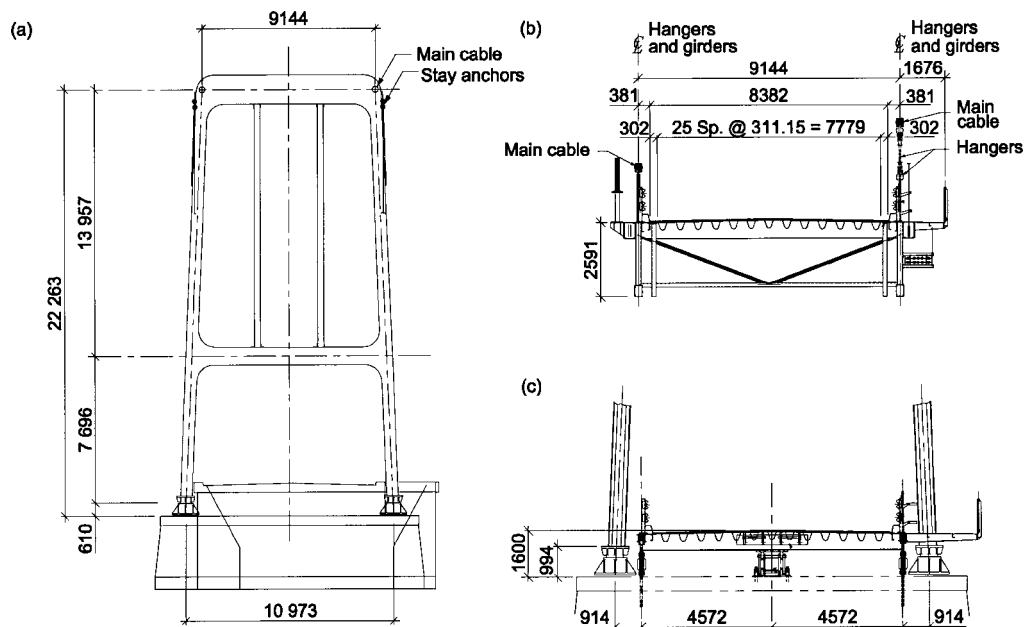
Beauharnois suspension bridge: (a) tower elevation, (b) cross section at midspan, and (c) cross section at support.
